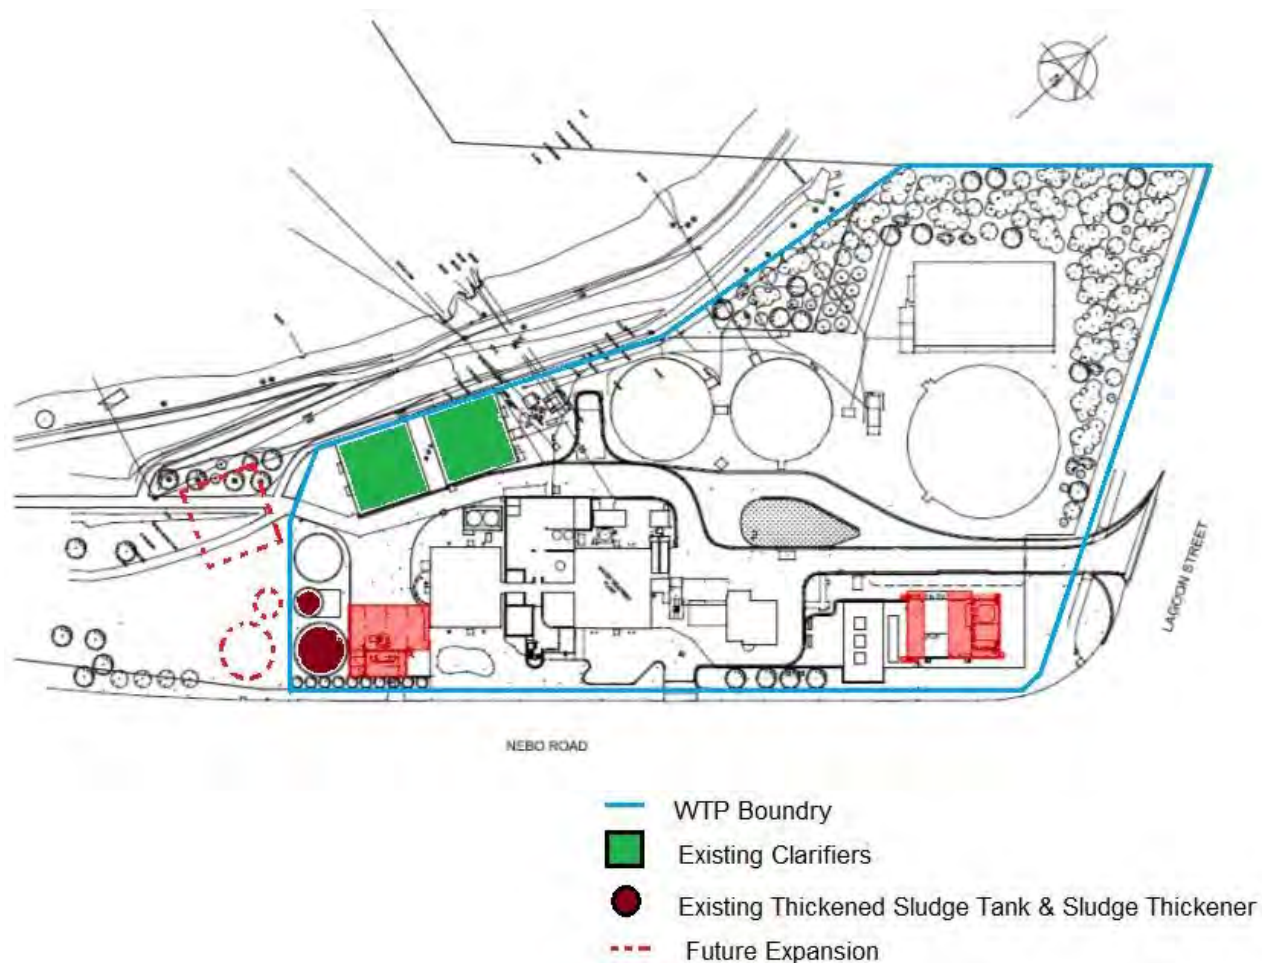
Plan Drawing of Nebo Rd WTP with Future Expansion Requirements.
